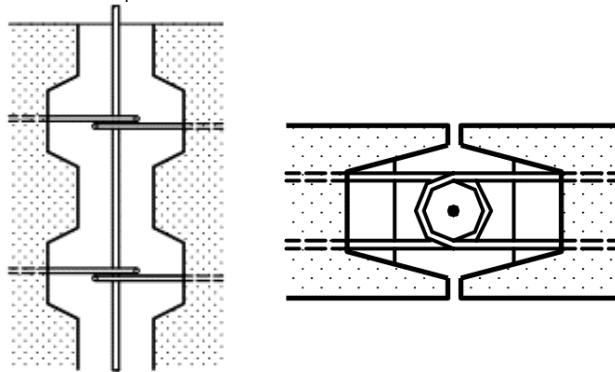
Typical shear key connection at a vertical joint between wall panels (fib, 2008)
